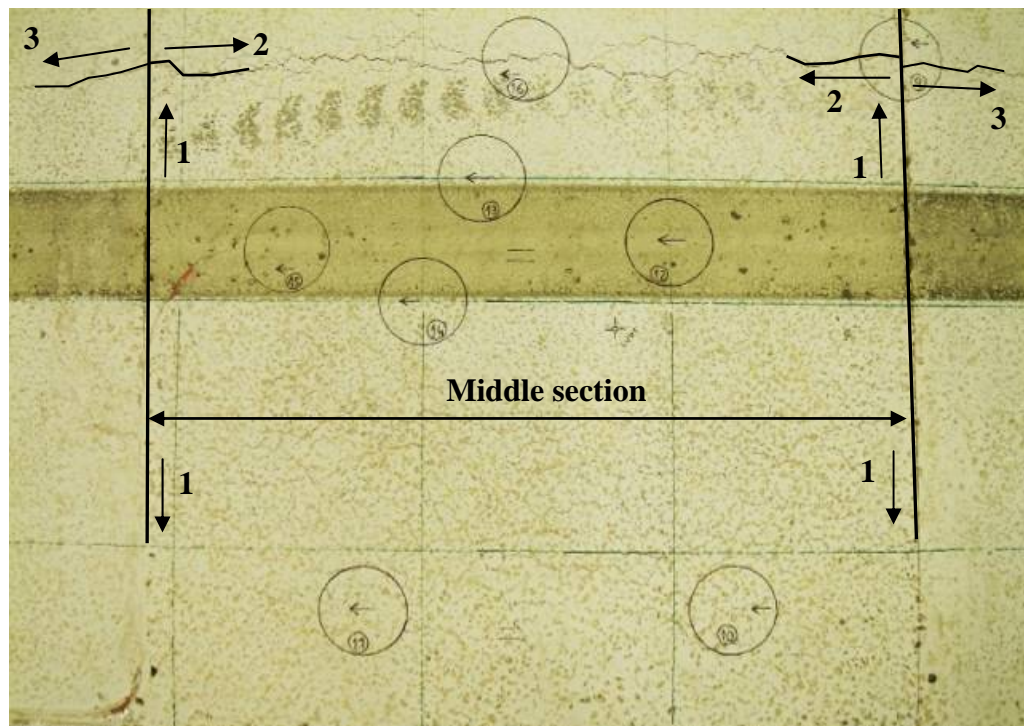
Appearance and propagation of the first cracks in the PTF pavement
